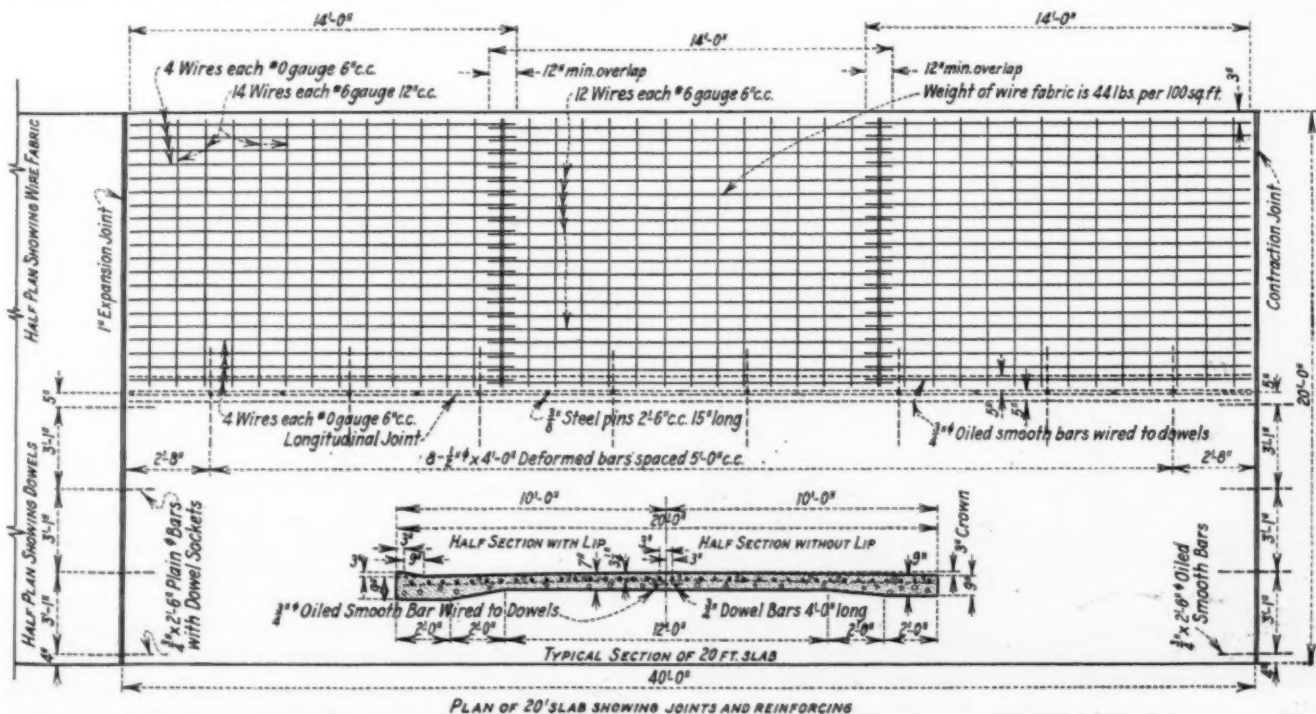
Typical Sections and Plan of Missouri Reinforced Concrete Pavement Standard
